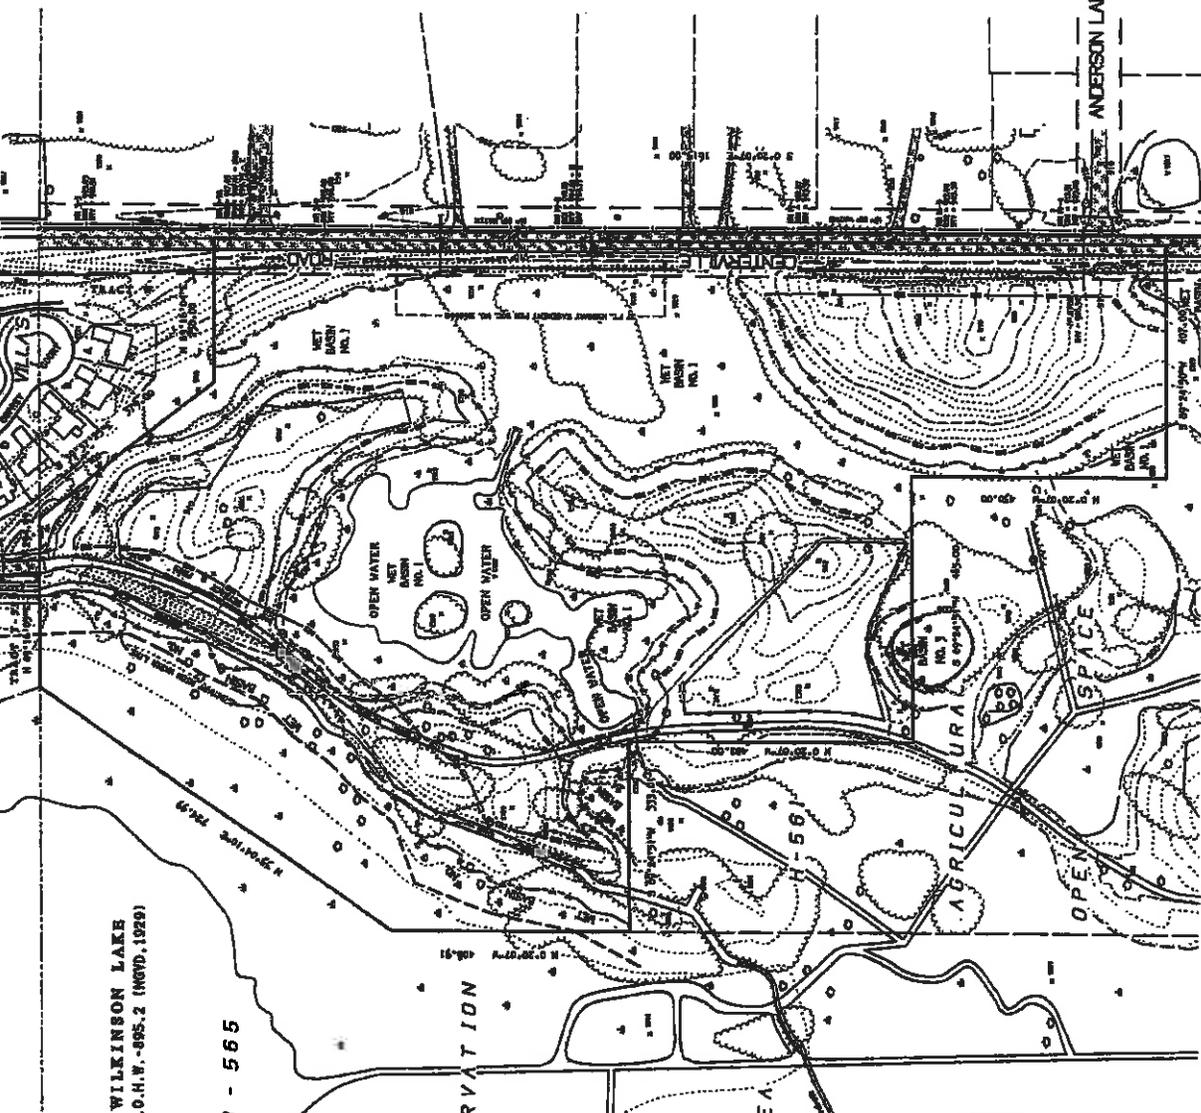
Wilkinson Villas Phase 1A Plan - Existing Conditions (Lot Layout)
